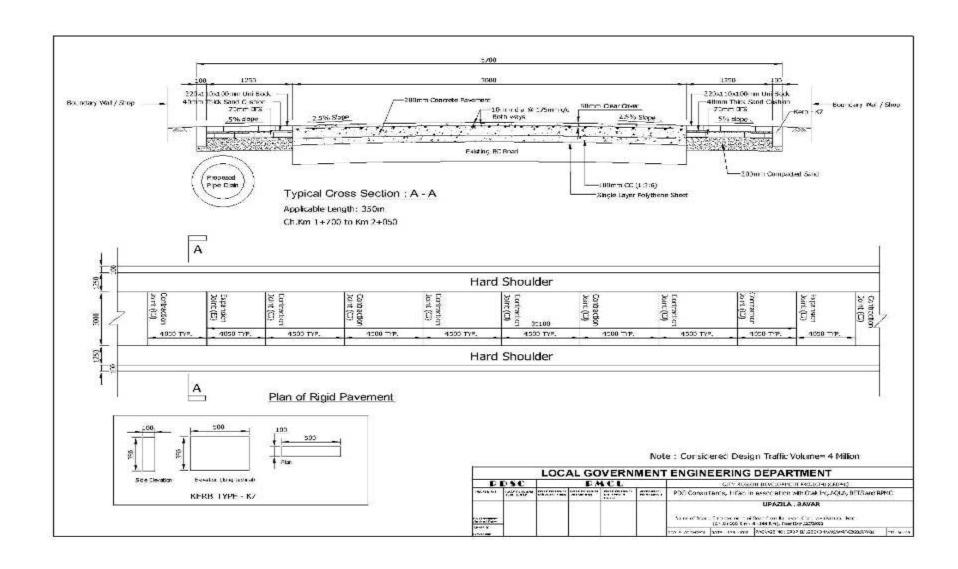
Typical cross section (Ch. 1+700 to 2+050 km, Plan of Rigid Pavement & Hard Shoulder)
